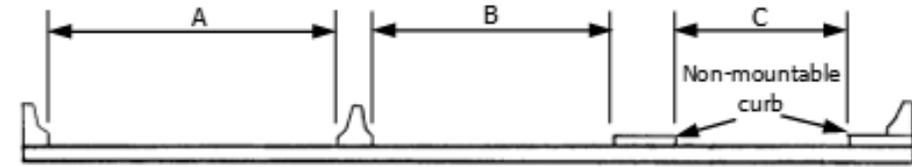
Cross-section view of a bridge deck with non-mountable curb and median barrier.
